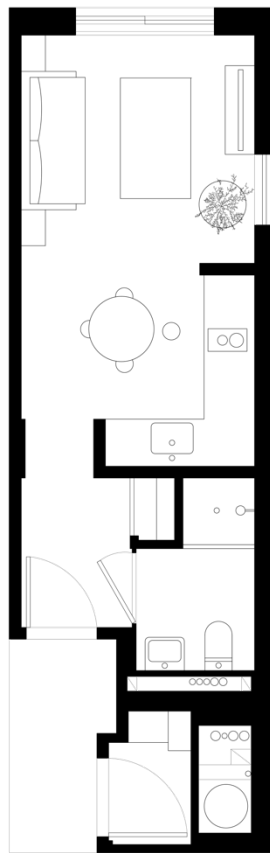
Unit plan of Ollie at Carmel Place. Drawing by the author
